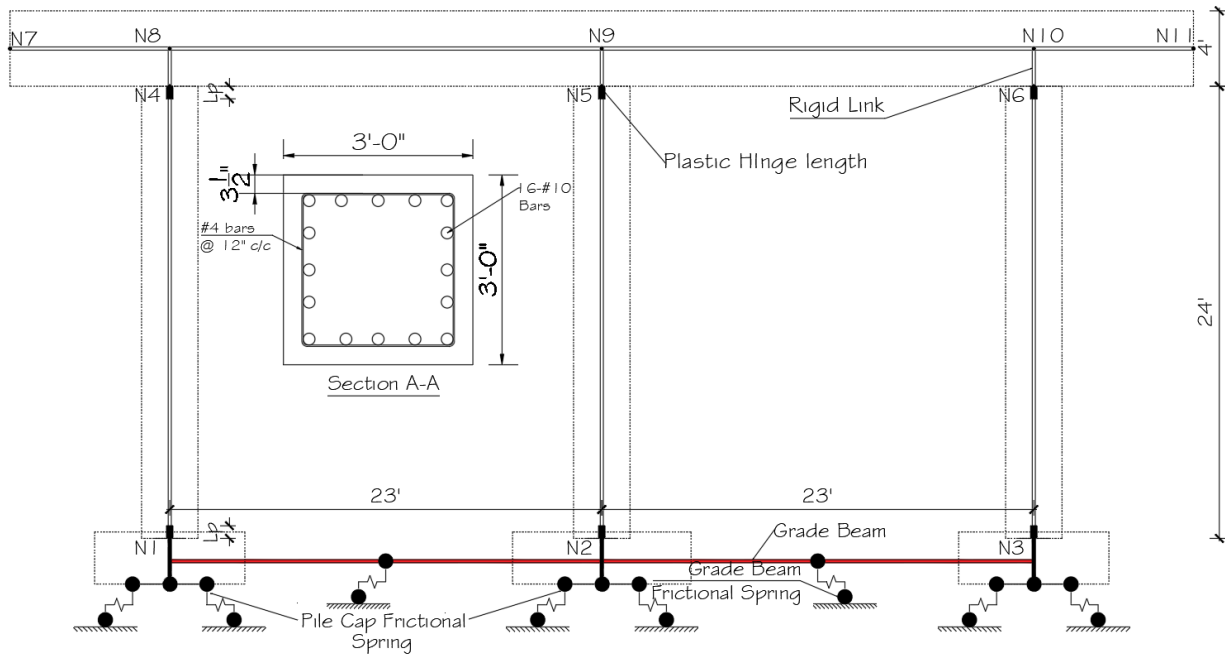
As-built bridge bent #5s ([Pantelides et al. 2004](#))
